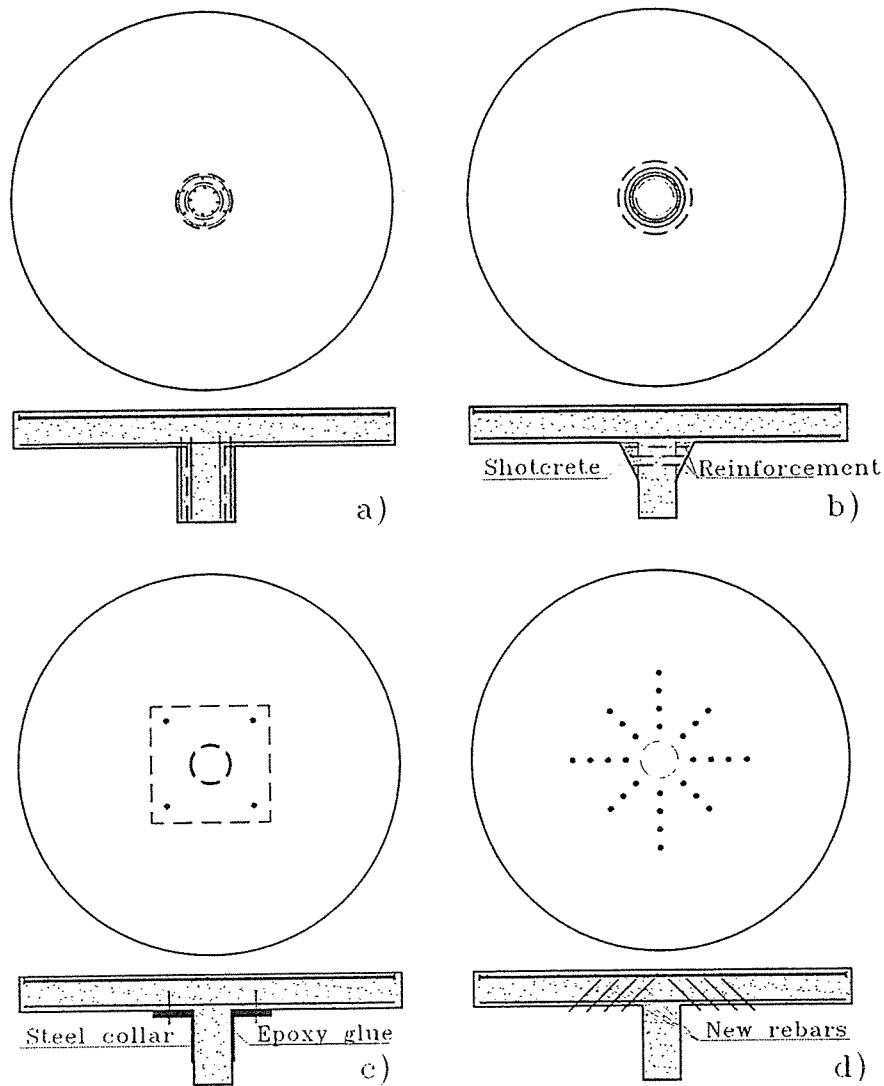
Examples of strengthening methods from the bottom side of the bridge slab. These kinds of strengthening could be applied while the bridges are open for traffic.
